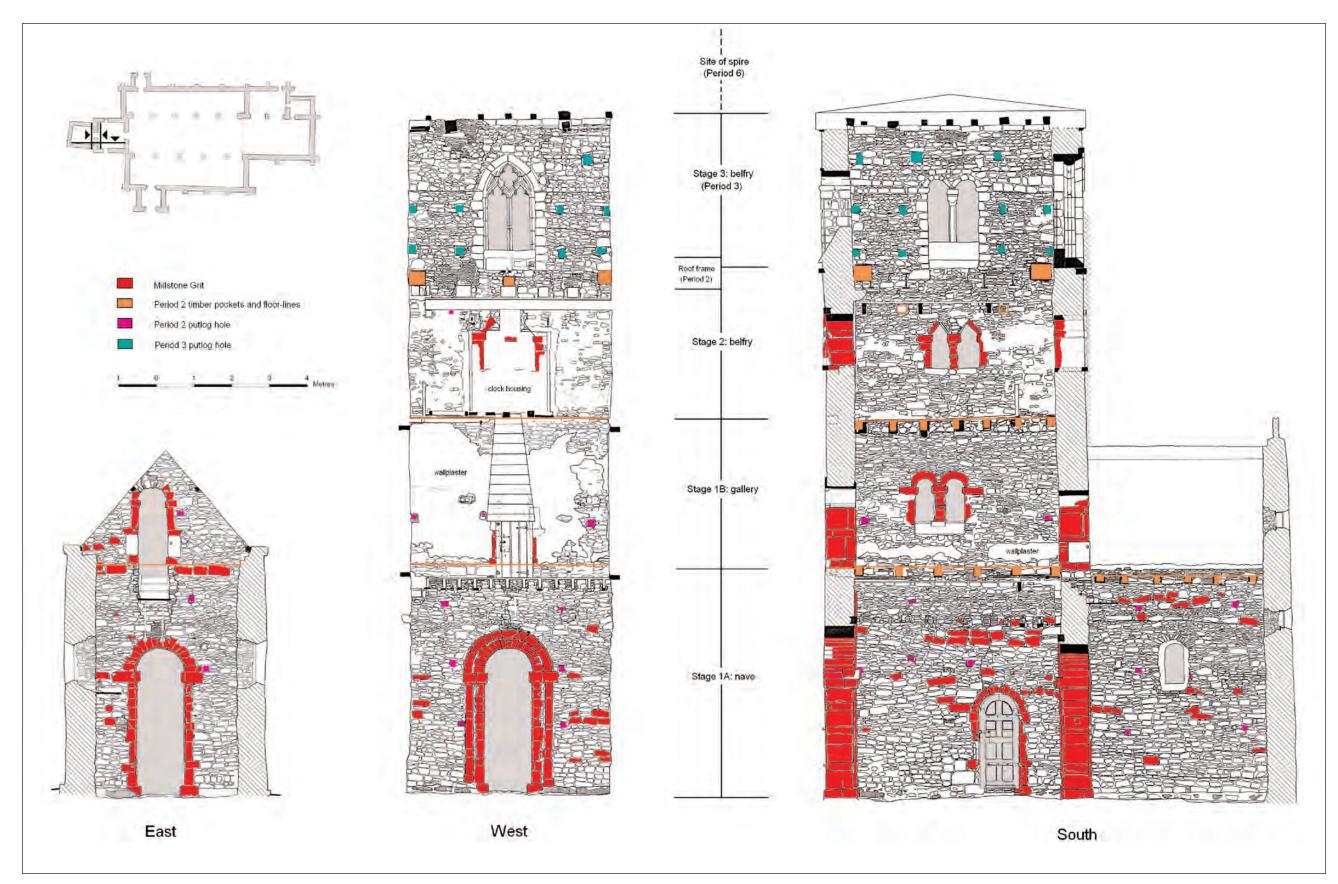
Internal elevations of the tower (south and west sides) and the western annexe (south and east), highlighting evidence for original structural timberwork. Scale 1:100. Drawing: Stephen Coll and Simon Hayfield
